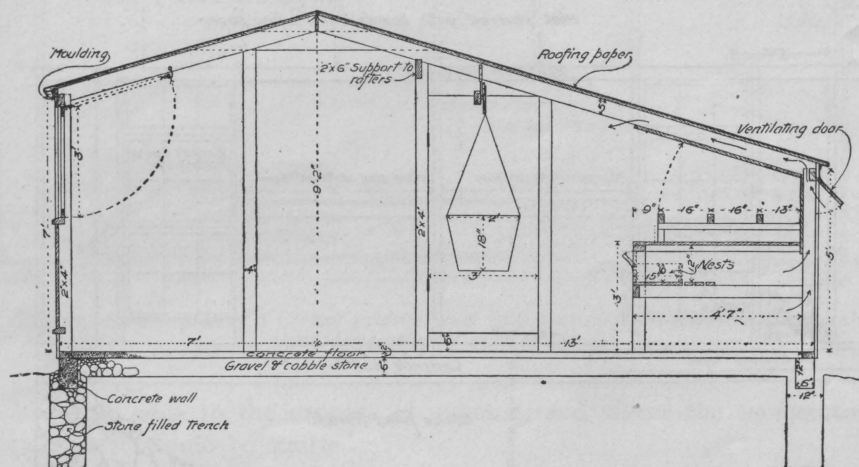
A cross-section plan of a Cornell poultry house with pens 20 feet square, adapted to the combination roof and ceiling around perches only
